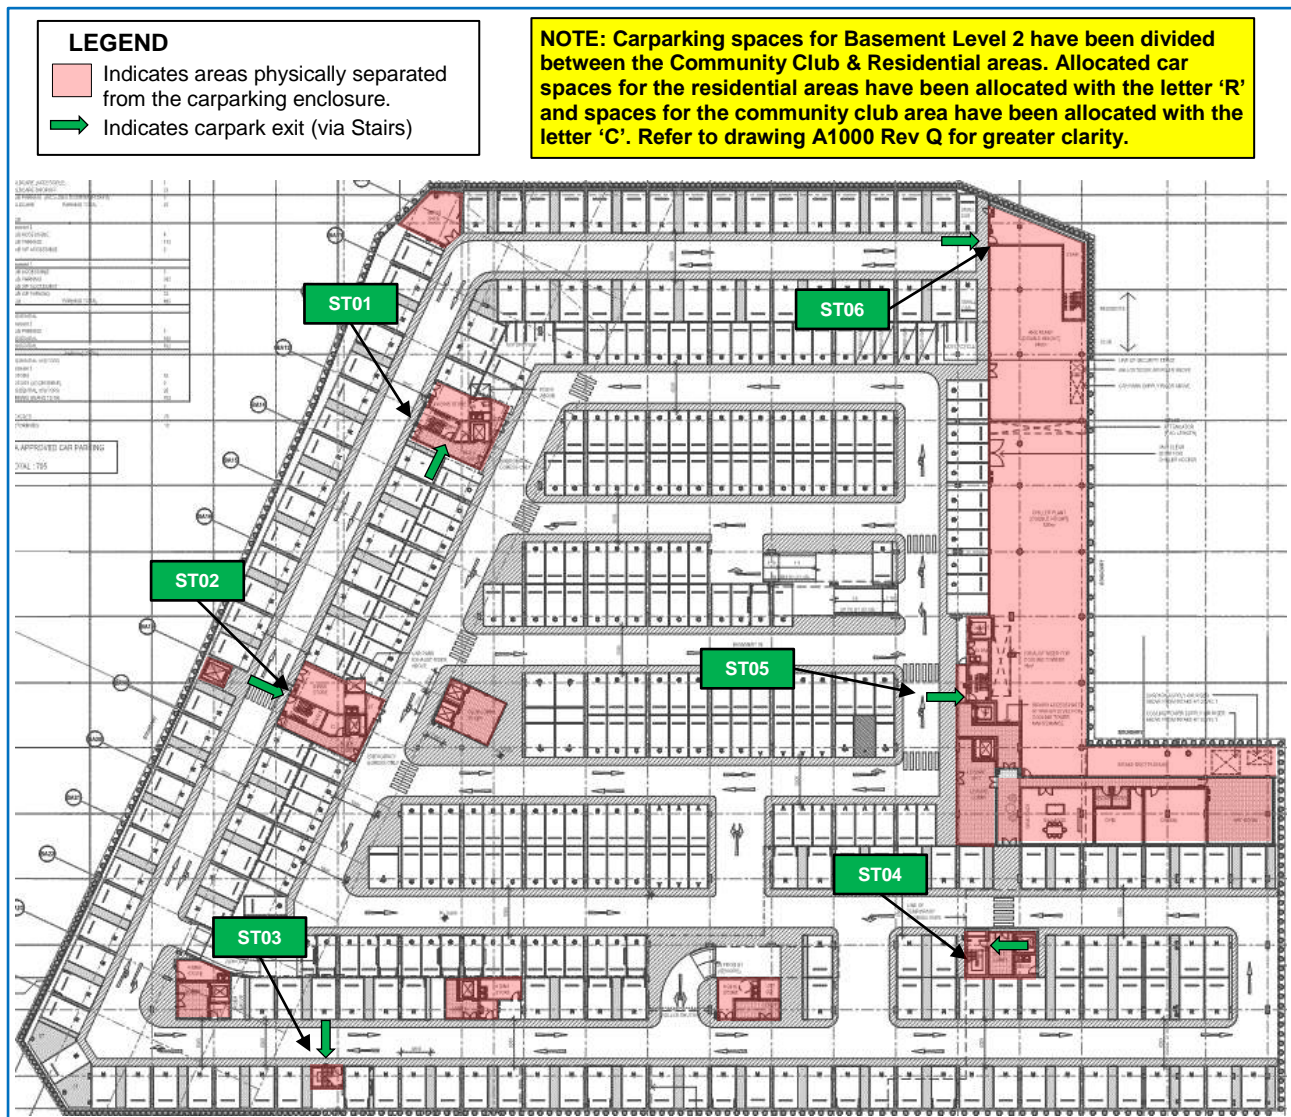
Overall Basement Level 2 Plan – extent of carparking areas and exits within
